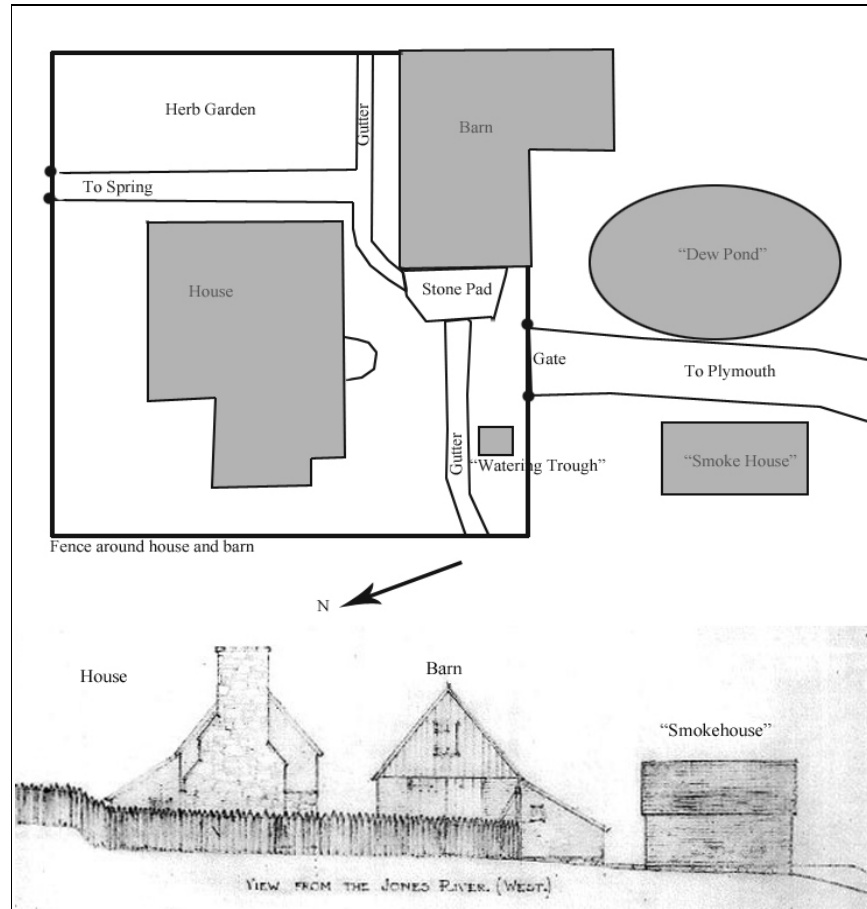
Strickland's plan and interpretive drawing showing the “smokehouse” he thought was located where we excavated in 2017.
